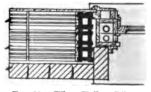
When Hollow Tile Are Laid on Side or Edge, Open Cells Are Left the Full Wall Height Unless Special Closure Blocks Are Used or Unless the Tile Butt Against Another Wall
